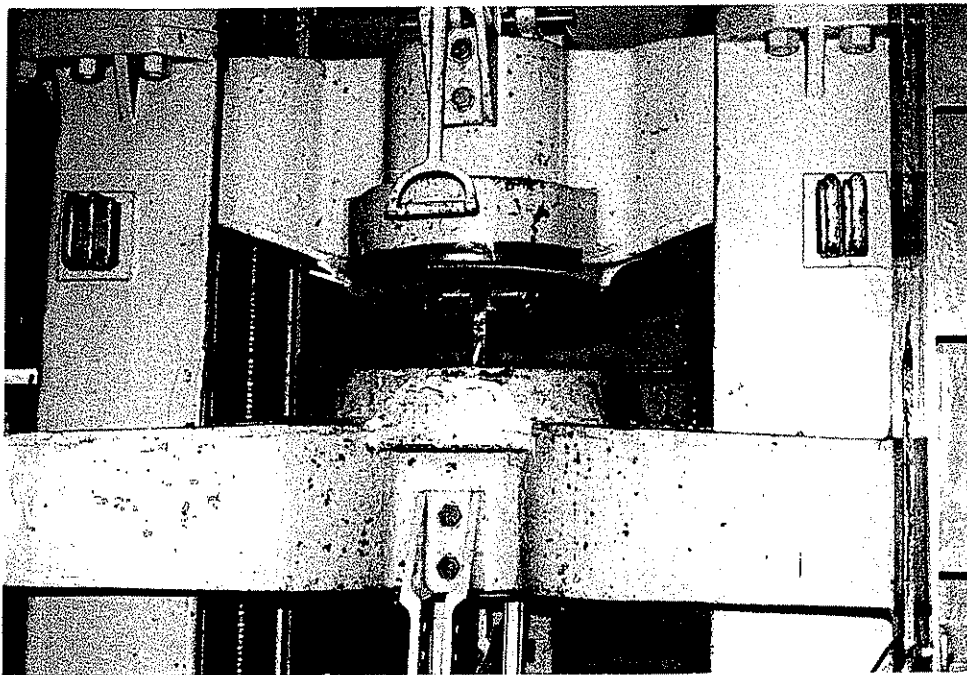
Flange Splice Tensile Specimen Installed in the Testing Machine
